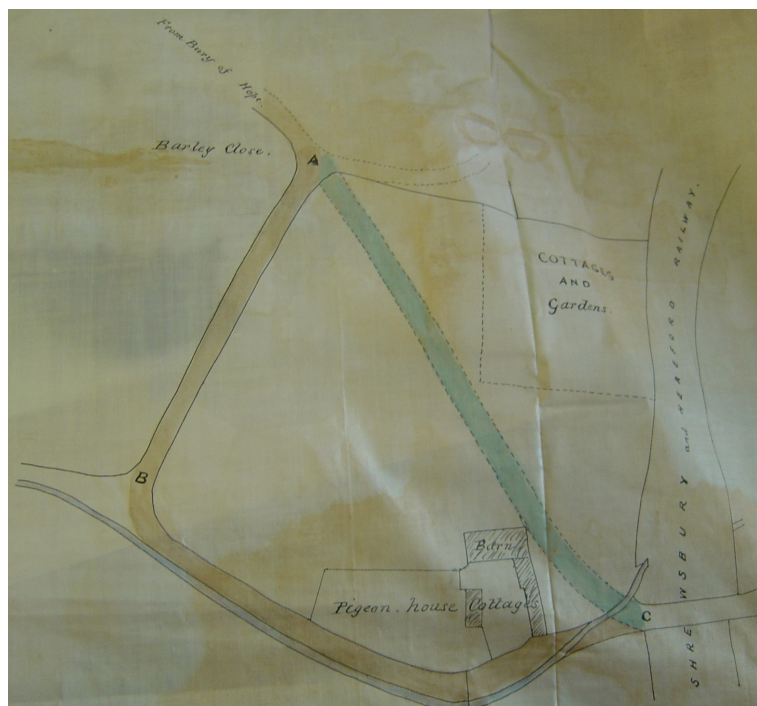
Plan showing line of proposed new highway at Hope under Dinmore in relation to Pigeon House Cottages (1867)
